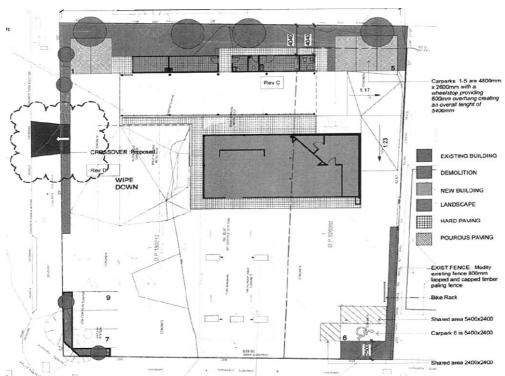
Approved site plan (DA 2017.170.3) demonstrating nine (9) car parking spaces.
